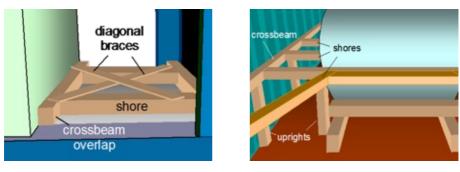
Shoring arrangement showing cross beam overlap and diagonal braces
